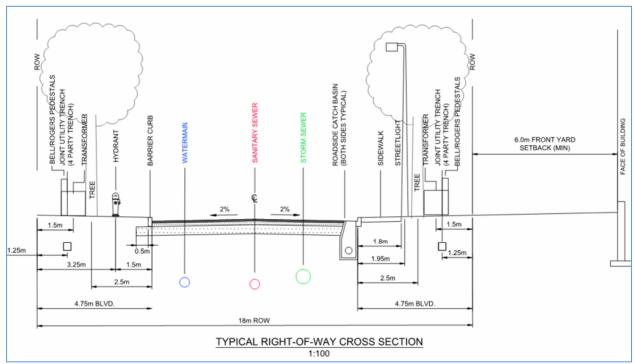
Typical cross-section of the proposed 18.0 metre right-of-way
